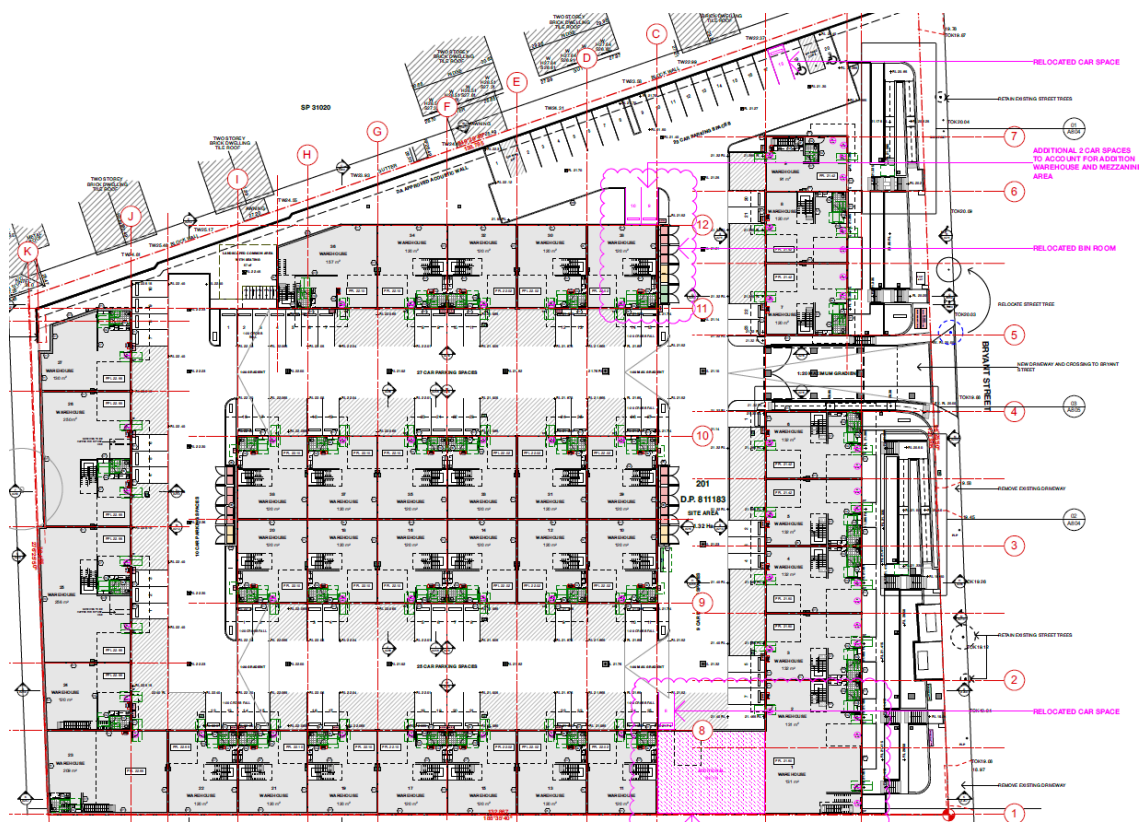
Modified ground floor Plan (Prepared by Architects Becerra)
